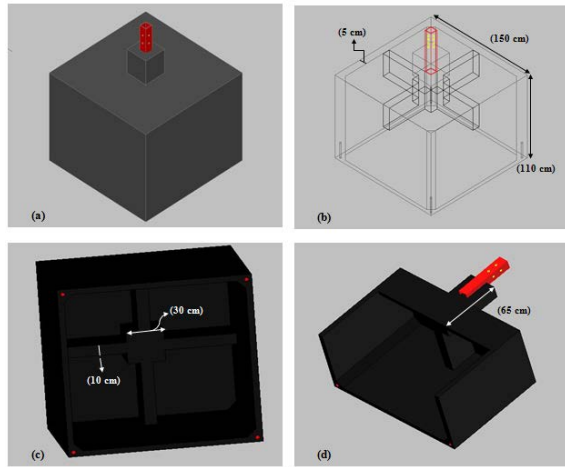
Proposed IBS footing: a) isometric view, b) Bracing system, c) bottom view, d) cross sectional view
